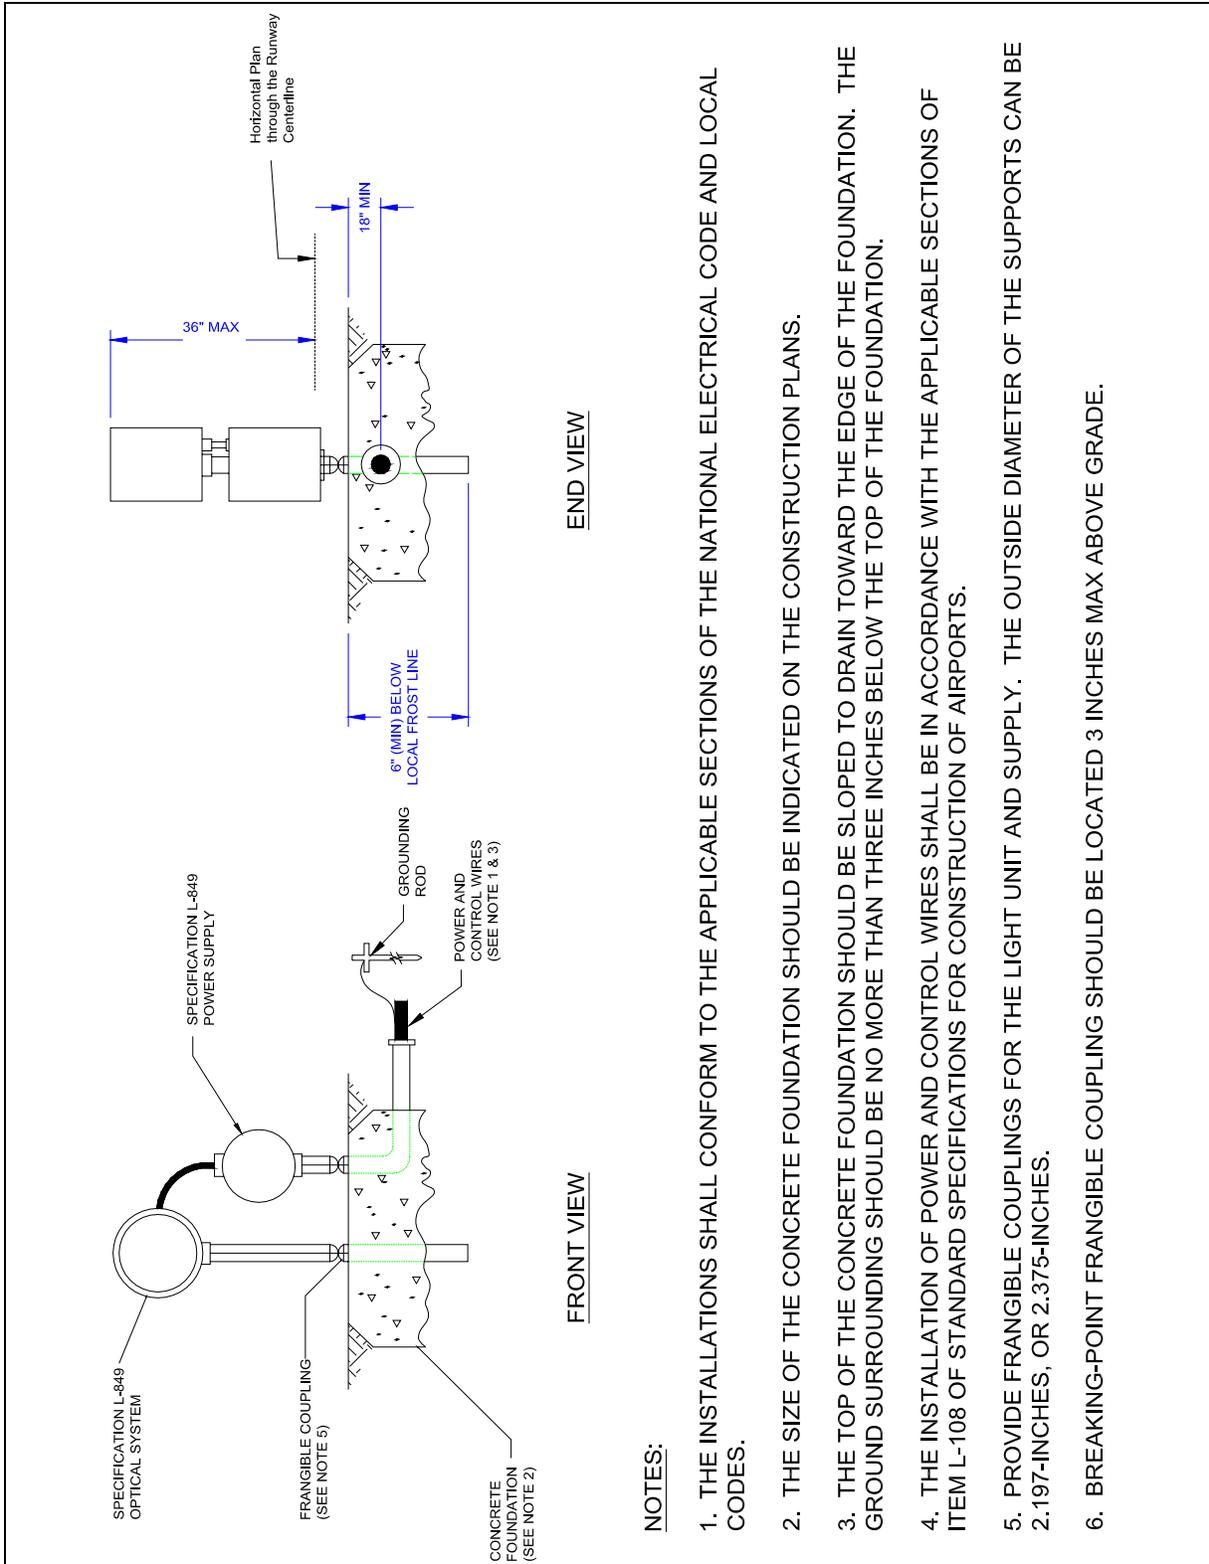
Typical Installation Details for Runway End Identifier Lights (REILs)
